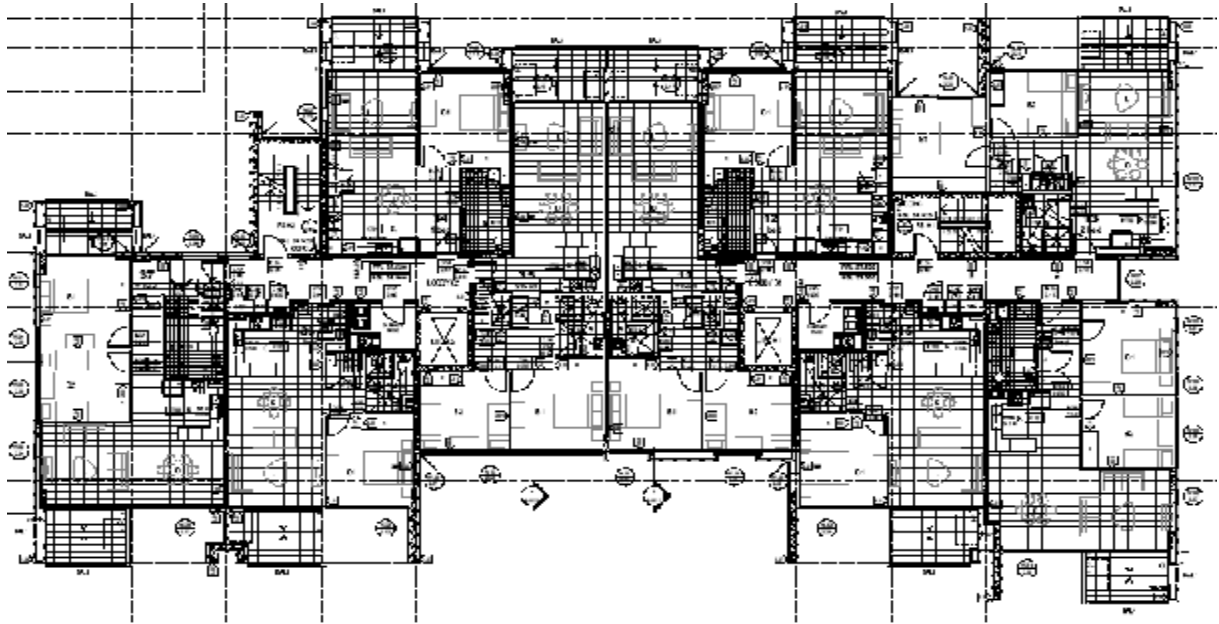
Typical floor plan – 15-17 Sturt Avenue, Telopea
